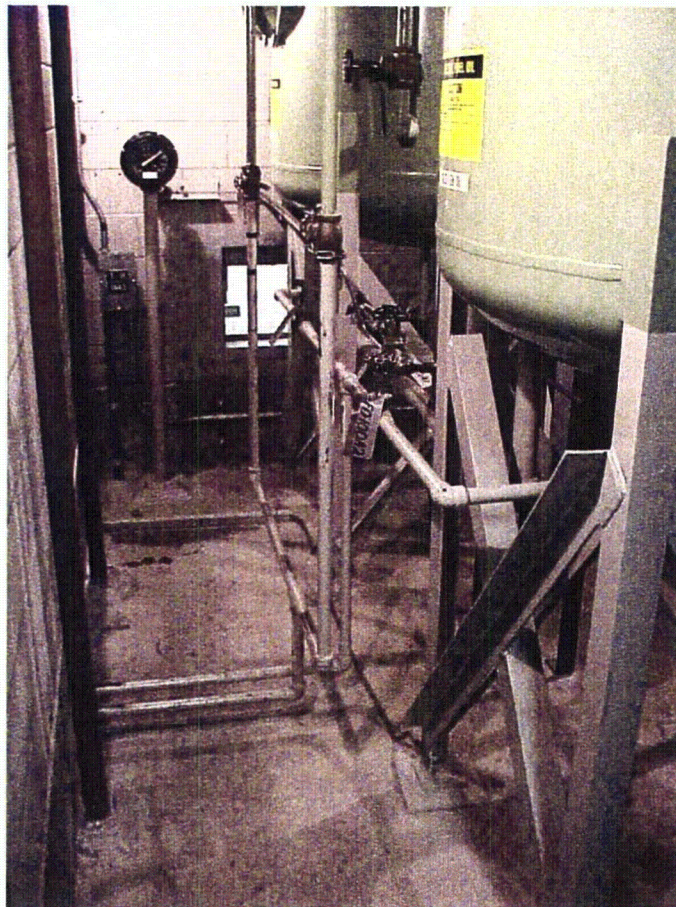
850 Gallon Diesel Generator Fuel Oil Day Tanks within below grade room floor containment.
